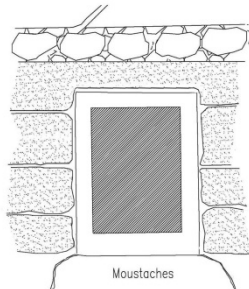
'Moustache' cracks observed at the bottom corners of window openings of the rammed earth houses in Mostefa Ben Brahim.
